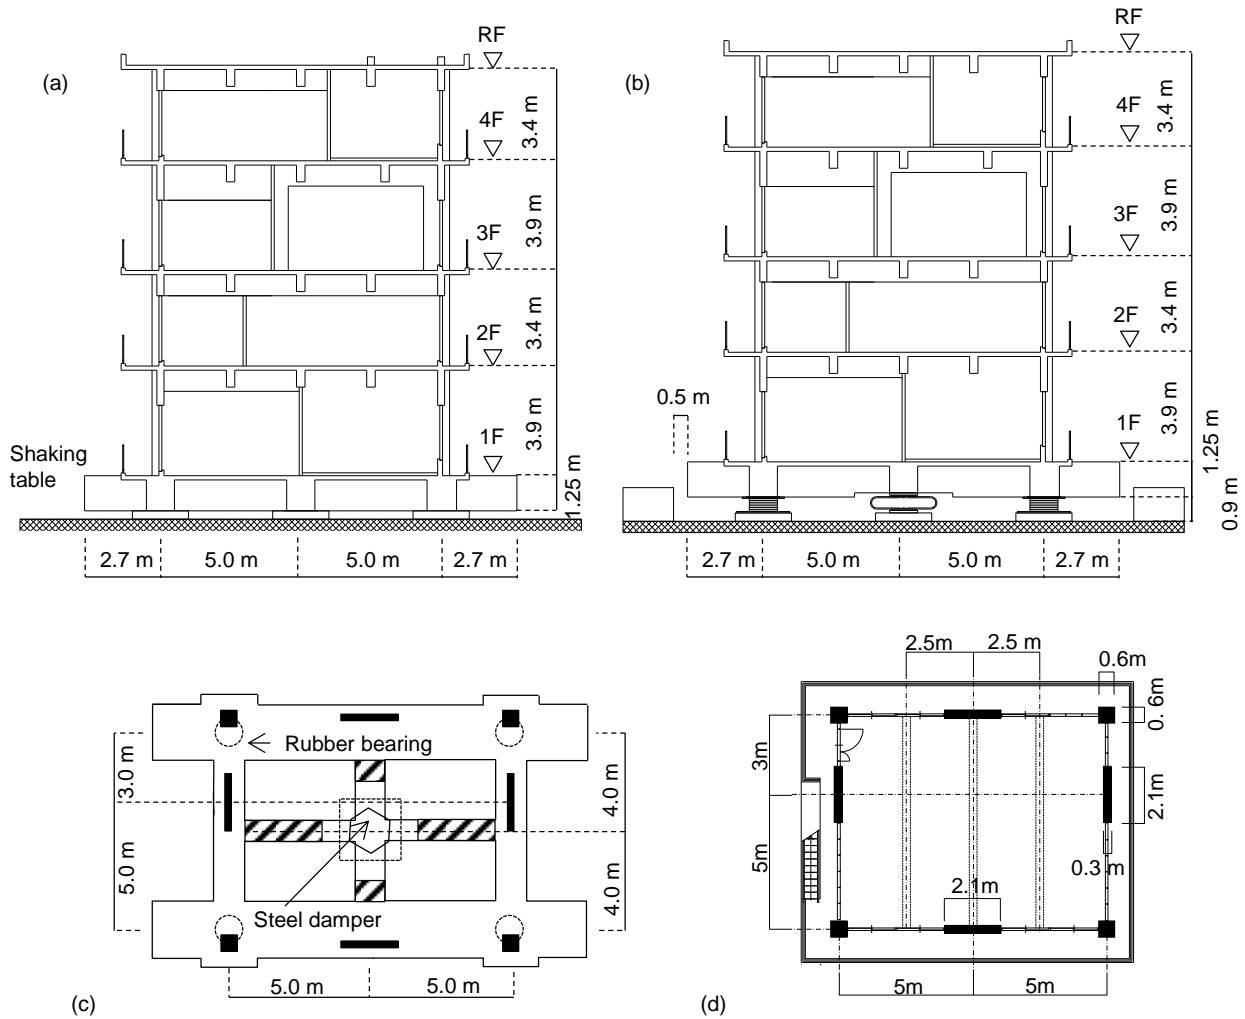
Specimen plan: (a) YZ elevation for fixed-base case; (b) YZ elevation for base-isolated case; (c) base floor plan and base isolators arrangement; (d) second to fifth floor plan
